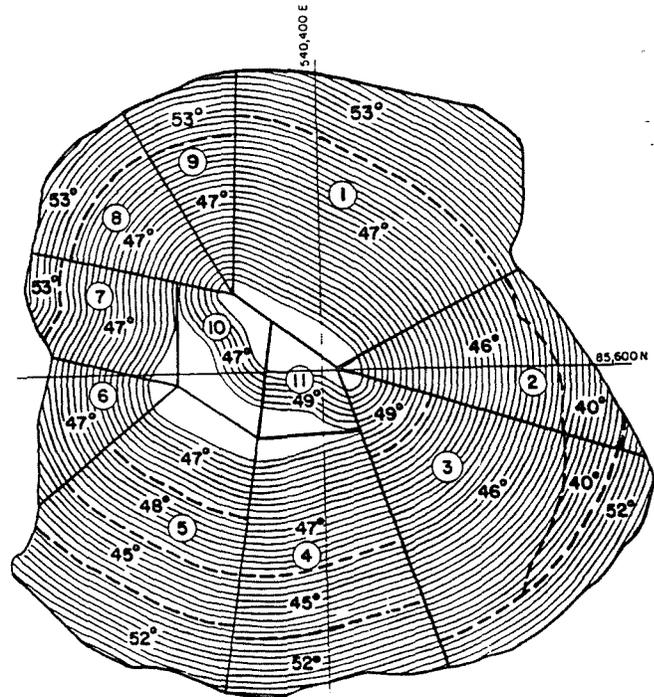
Cuaajone design sectors and recommended interramp angles.
